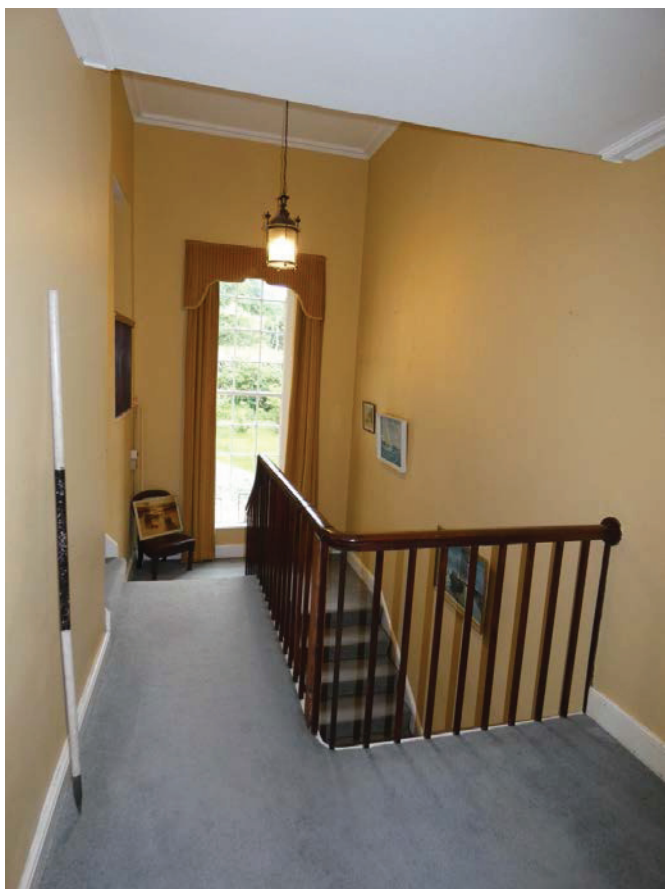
(left): Top of the main staircase in Room F5, viewed from the south-west
